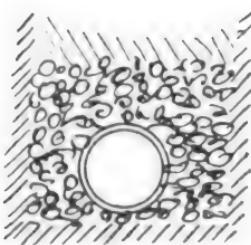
Open-jointed Pipe-drain, surrounded with gravel.
